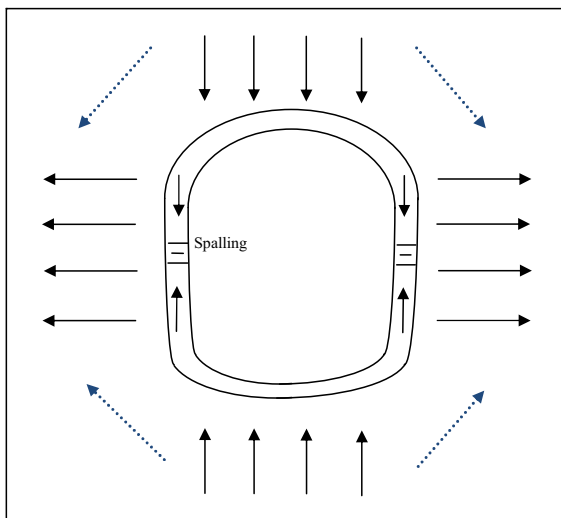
Mechanism of spalling of tunnel lining
